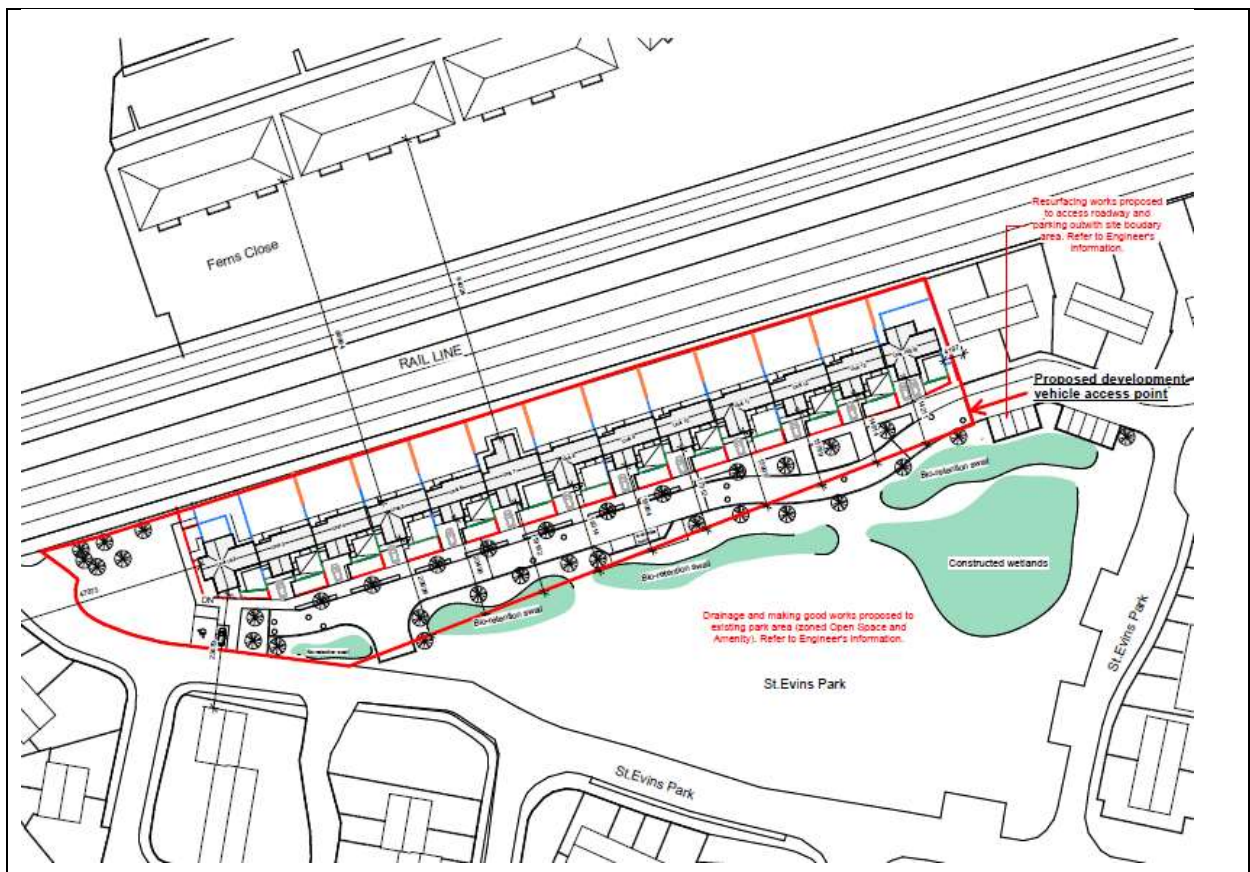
CAD Drawing showing the proposed housing scheme to be located at St Evins Park, Monasterevin, Co. Kildare, adjacent to the Rail Line.
